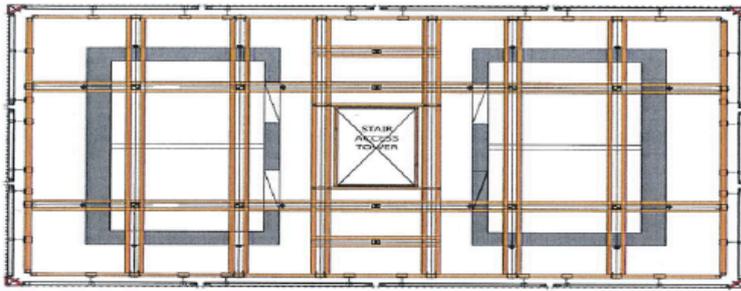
PLAN VIEW OF MAIN GRID WORK LAYOUT
